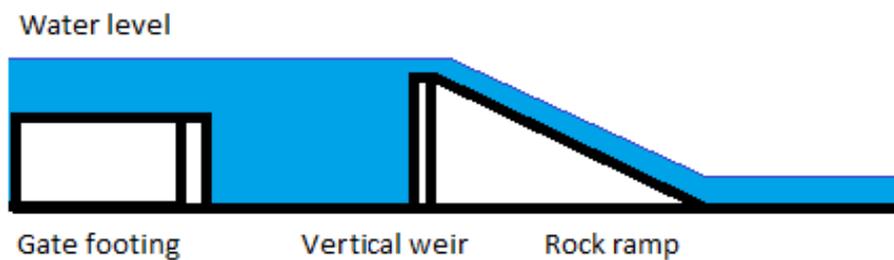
Longitudinal site plan of Tidal Crane Barrier 1
